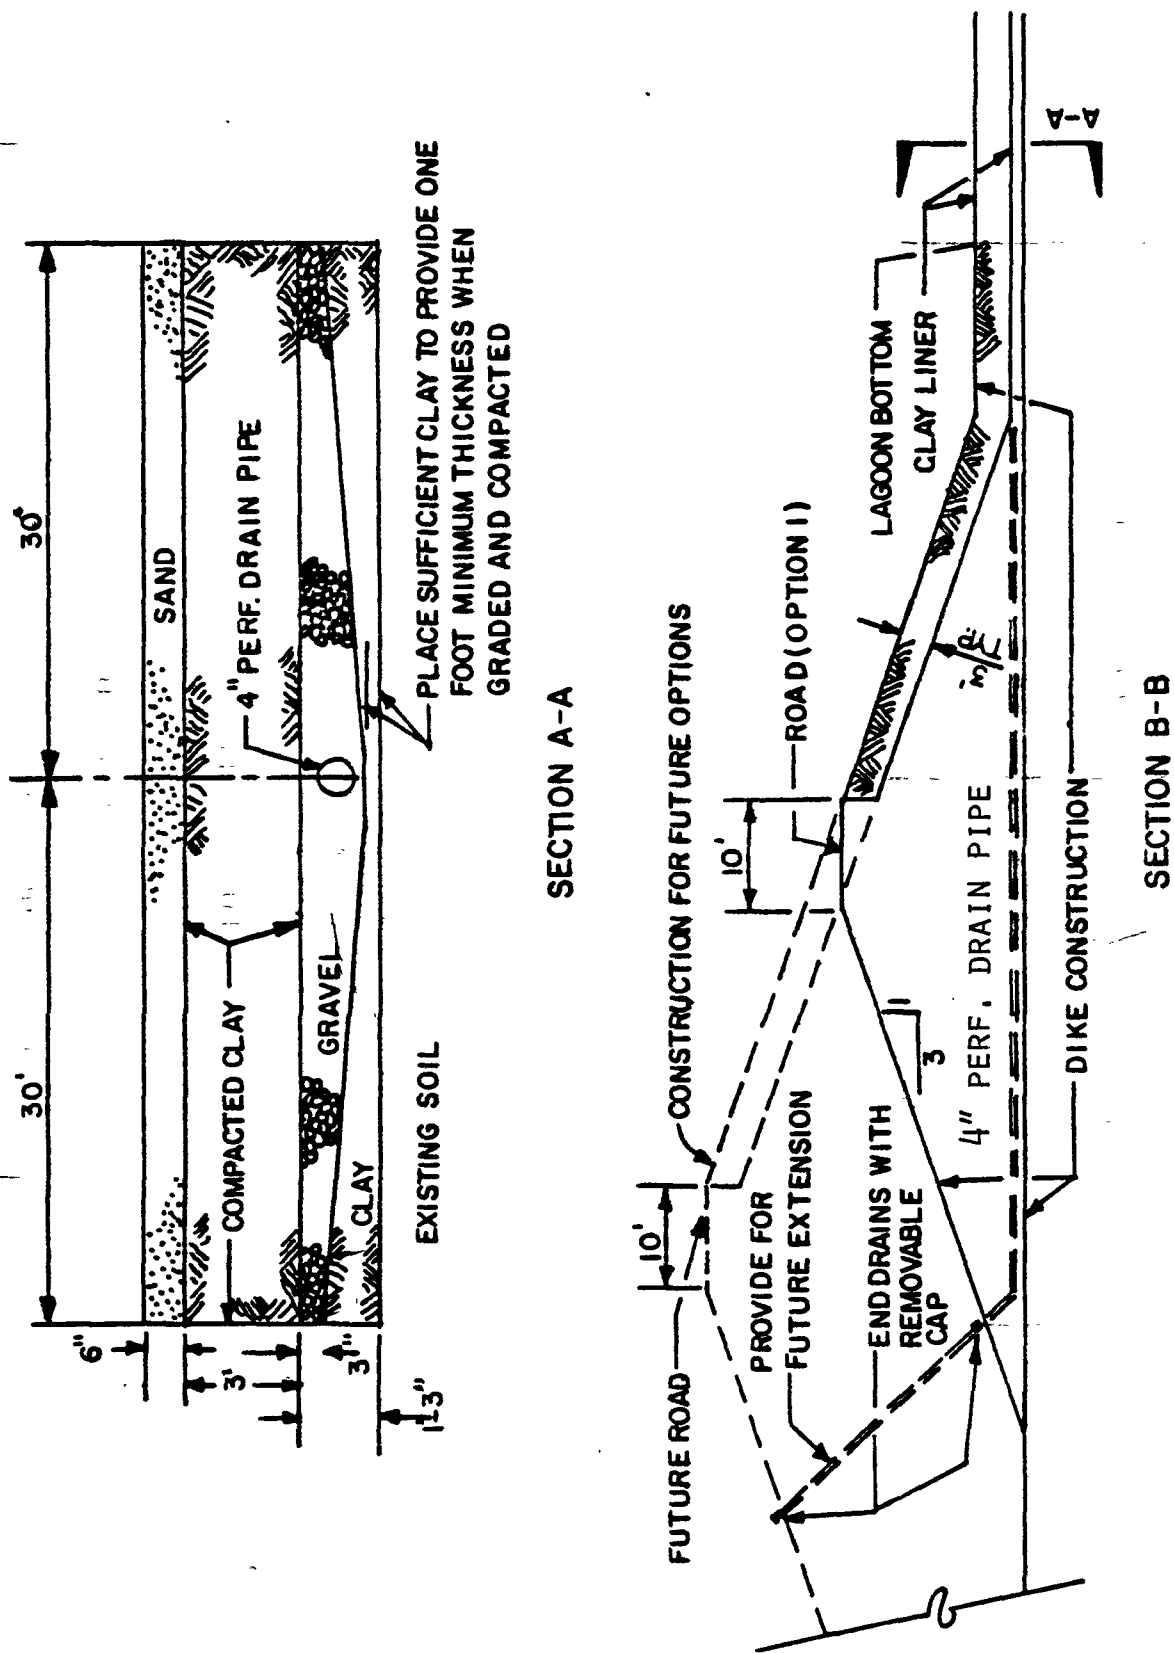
CROSS-SECTIONS OF LAGOONS
